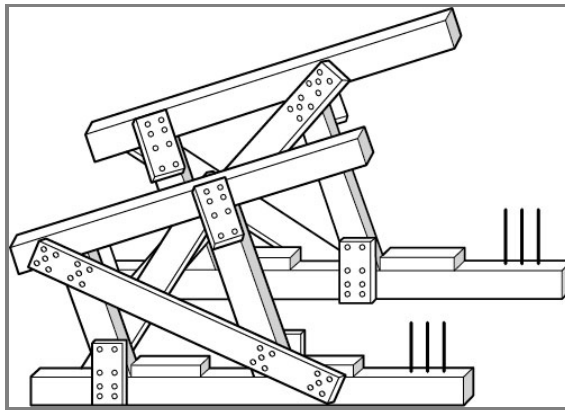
(d) Sloped Floor Shore Type 3.
